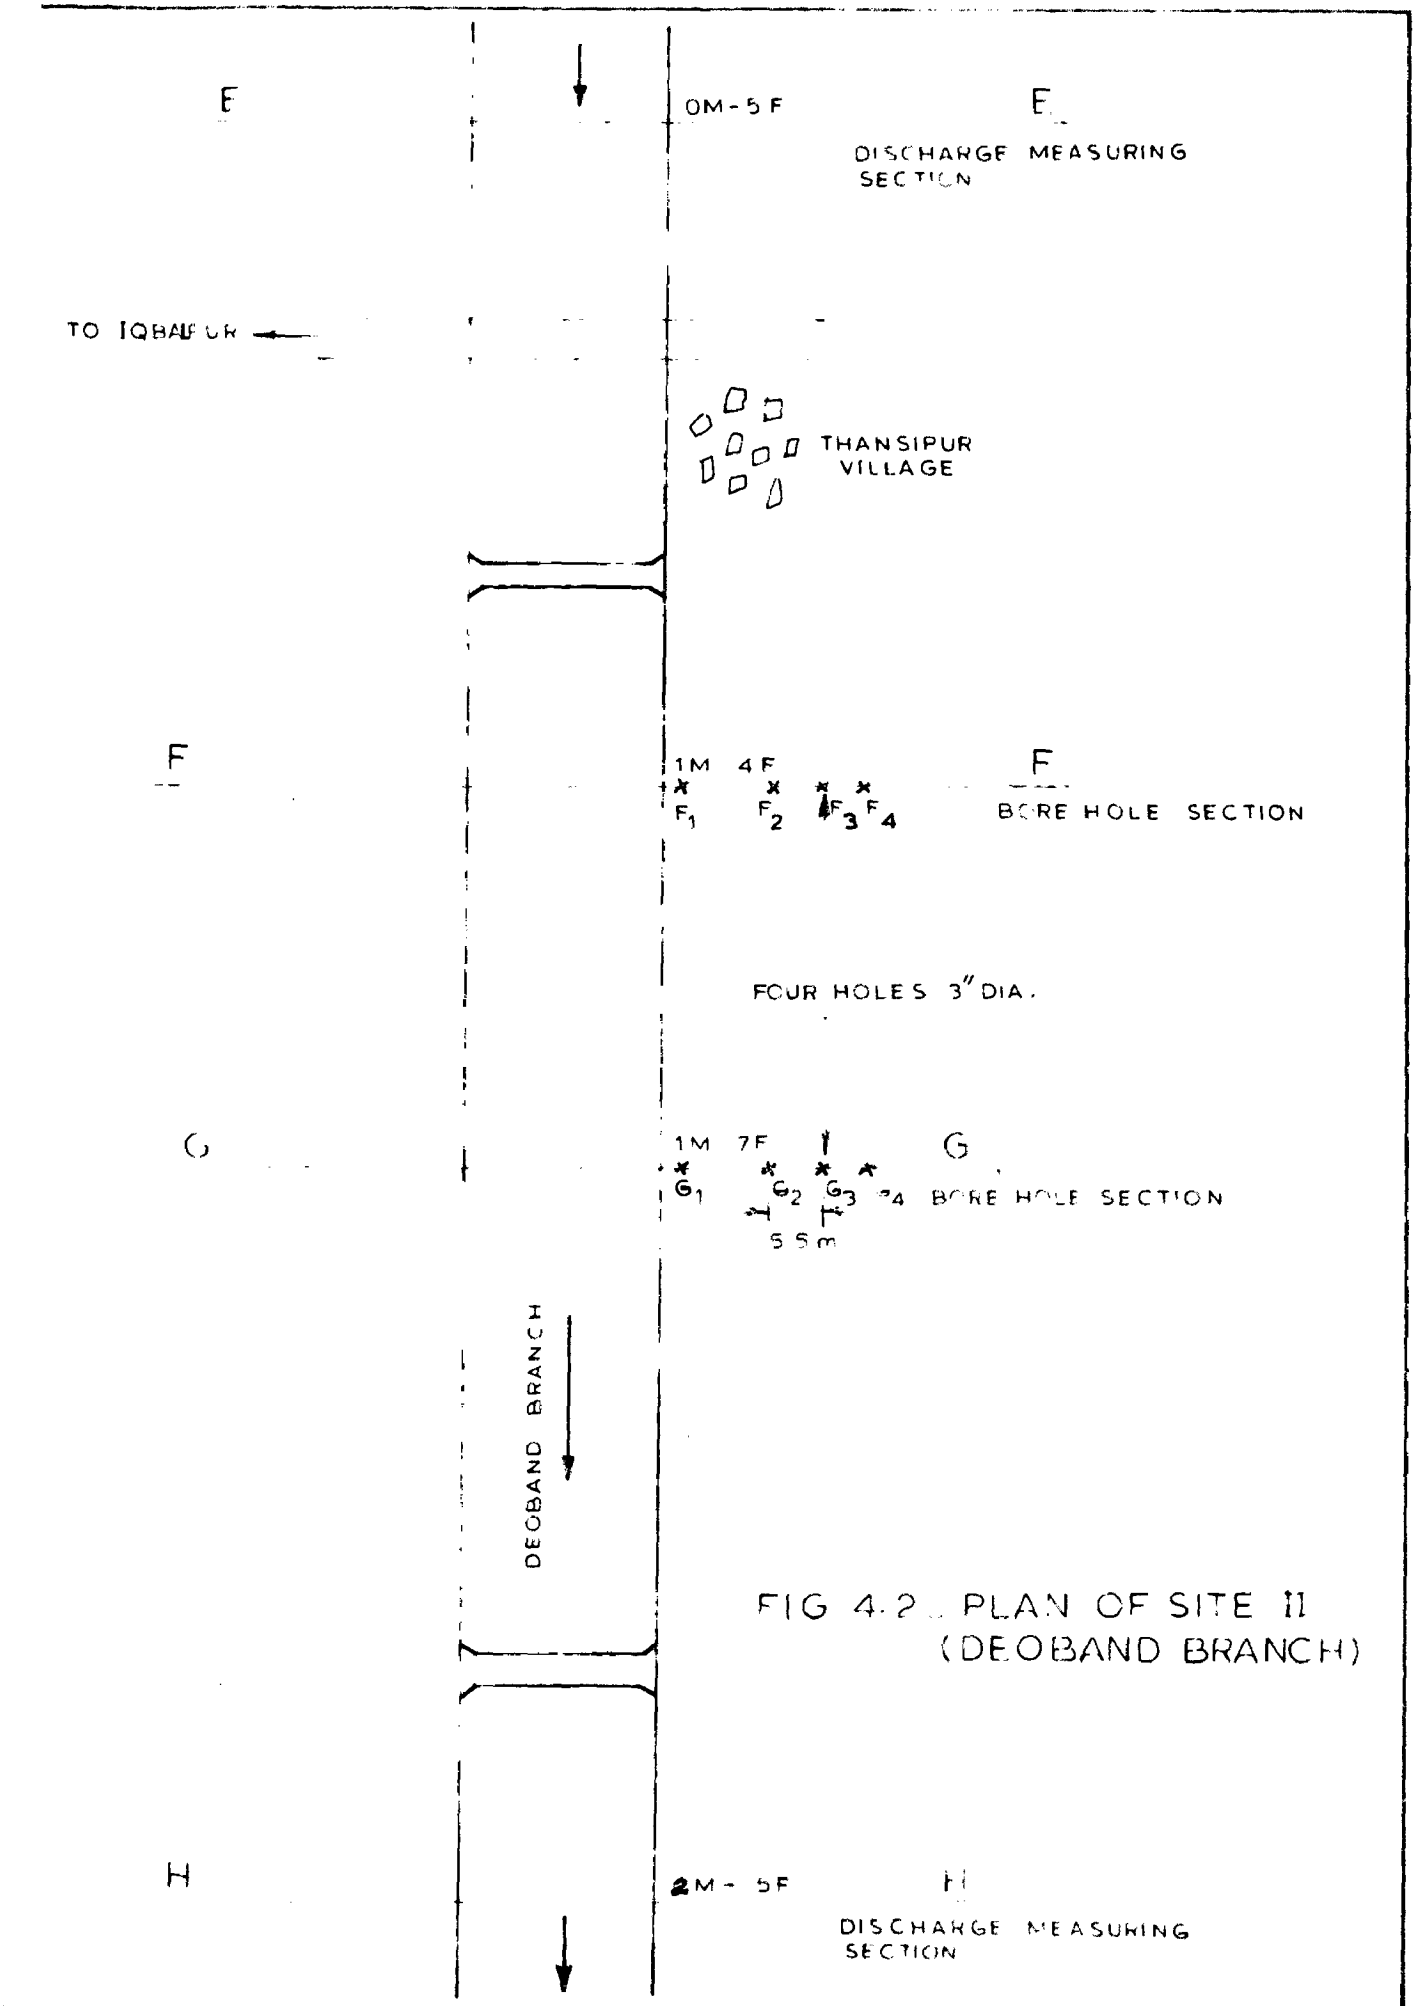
PLAN OF SITE II (DEOBAND BRANCH)
